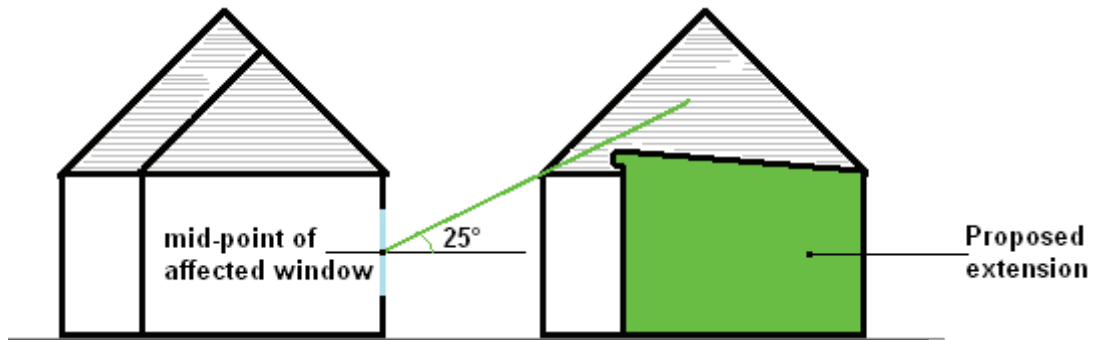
Fig B: Proposed extension would not result in loss of daylight to adjacent window of a habitable room
